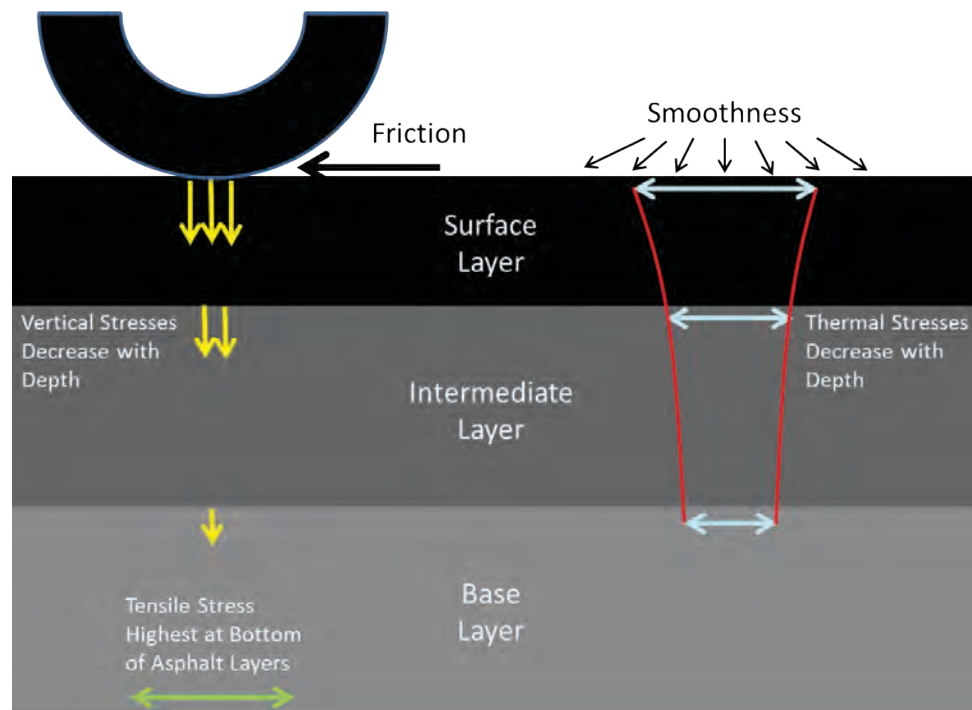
Loading and Surface Demands on Asphalt Pavements.
